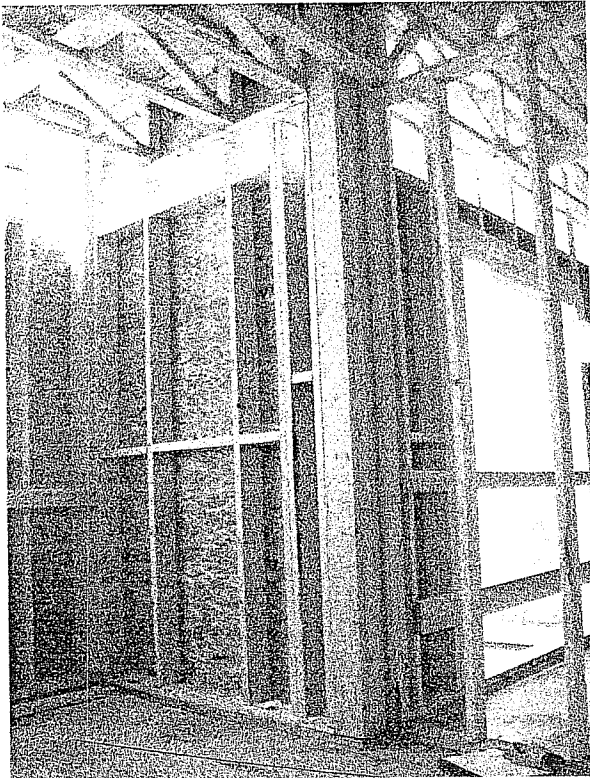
Interior elevation of wall located at Grid line G./S5.5 – second floor.
